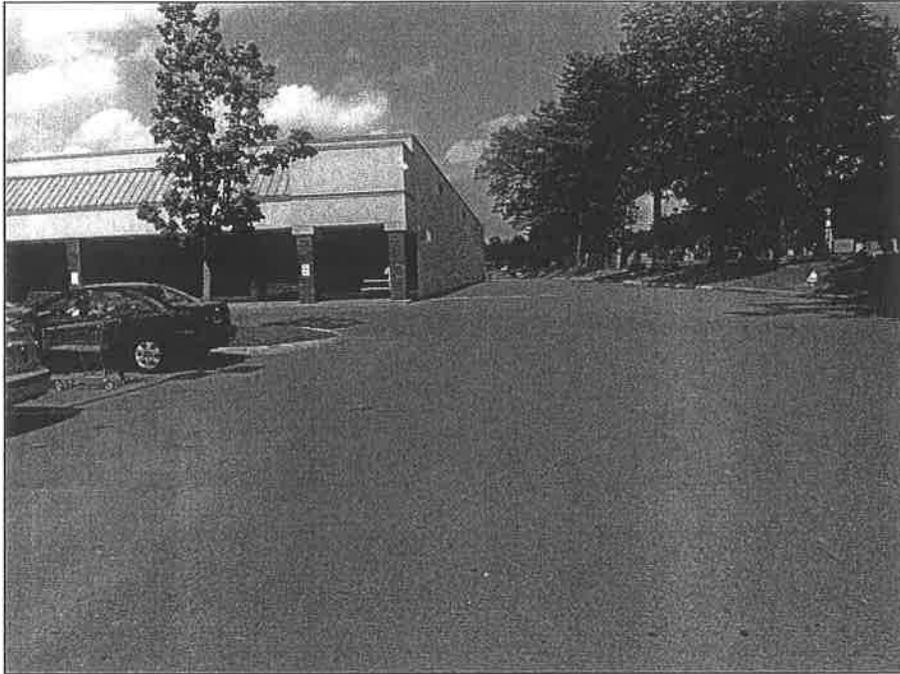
Approach to the proposed Hannaford To Go and storefront
